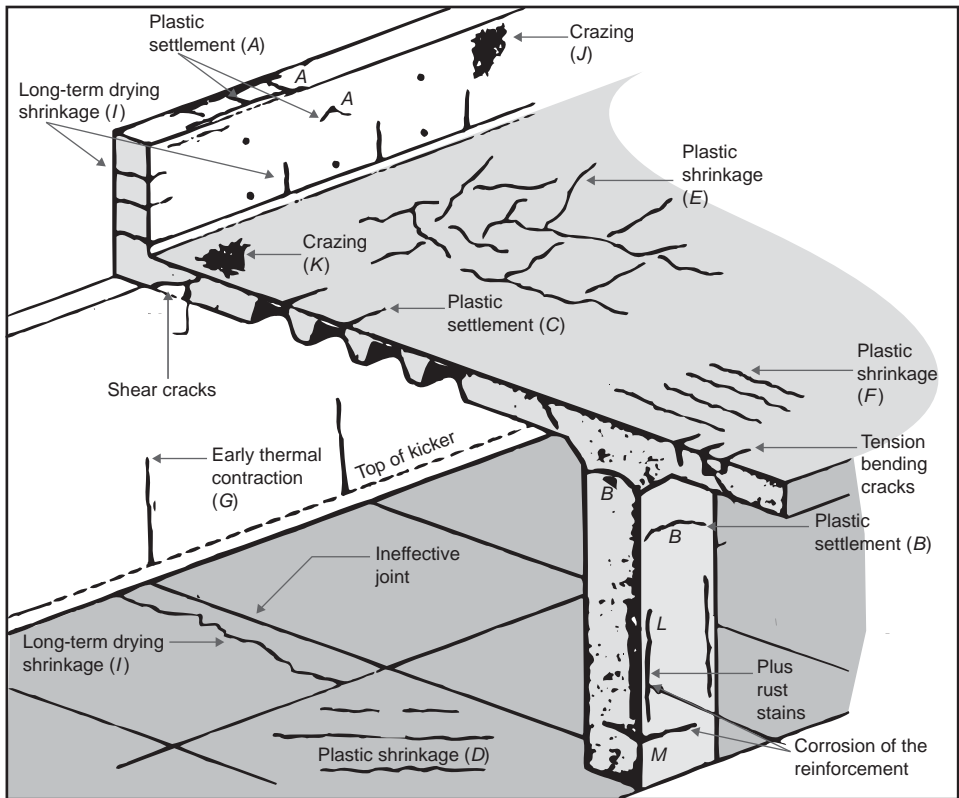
Cracks in a hypothetical concrete structure. (Adapted from Concrete Society, *Construction Cracks in Concrete*, The Concrete Society, U.K. Technical Report, No 22, 1985.)
